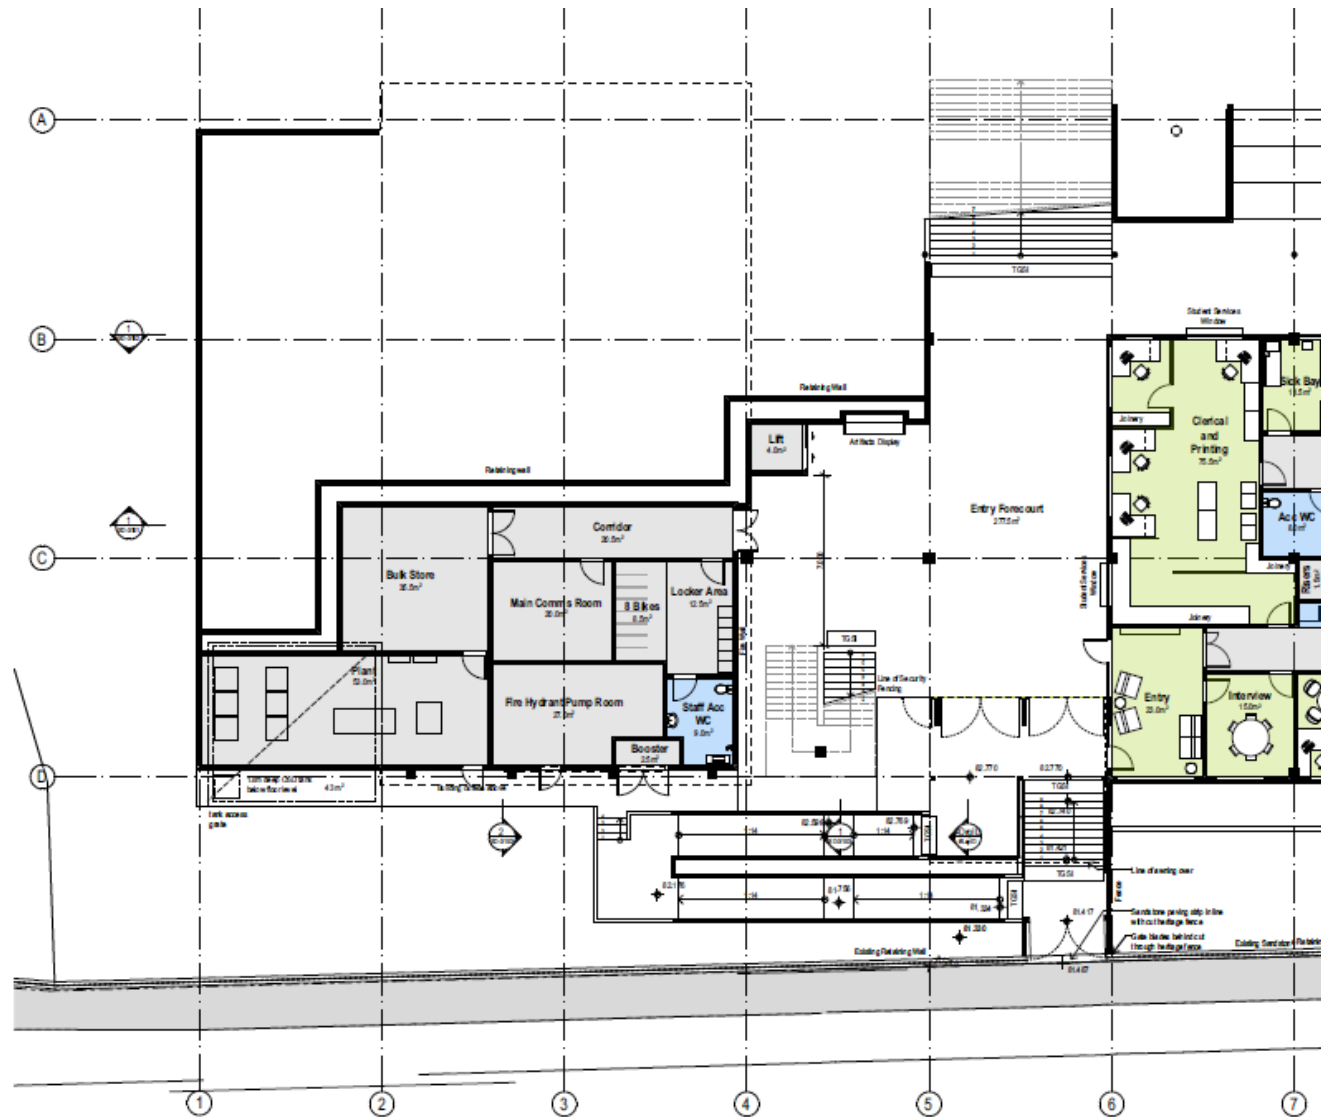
Building J Level 1 Floor Plan. Source: Fulton Trotter, 2021; Drawing No. SD-2001, Rev F, 13.8.2021.
